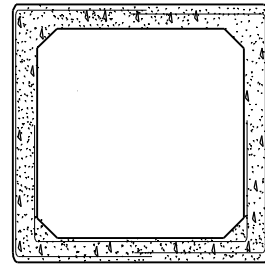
DETAIL OF PRECAST CONCRETE BOX CULVERT END SECTION
